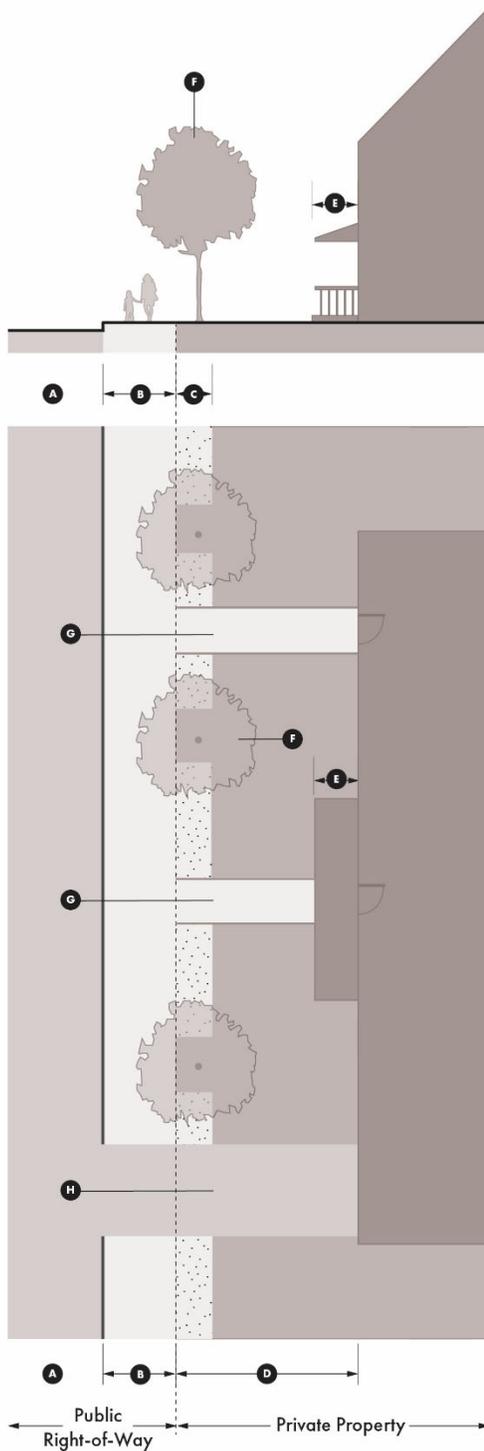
C: County standard for Single-Unit and Multi-Unit (Private Entry) fronting major and secondary highways where a sidewalk is provided without street trees.
